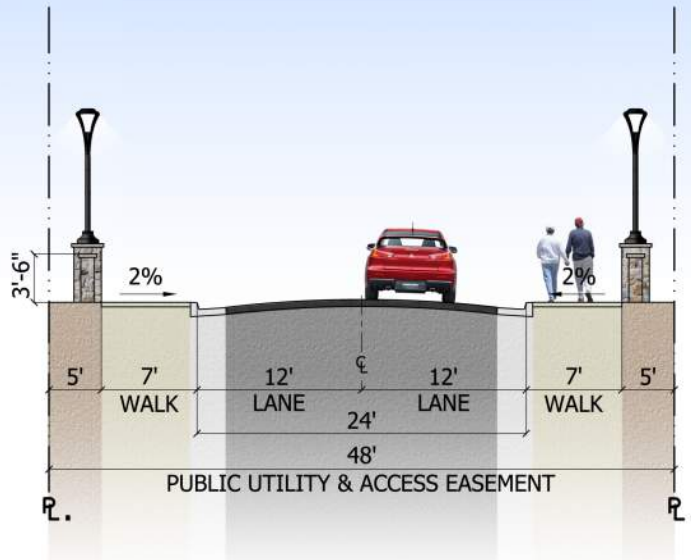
Street Section – Altair Vista Culverts & A Street Bridge (Private)
